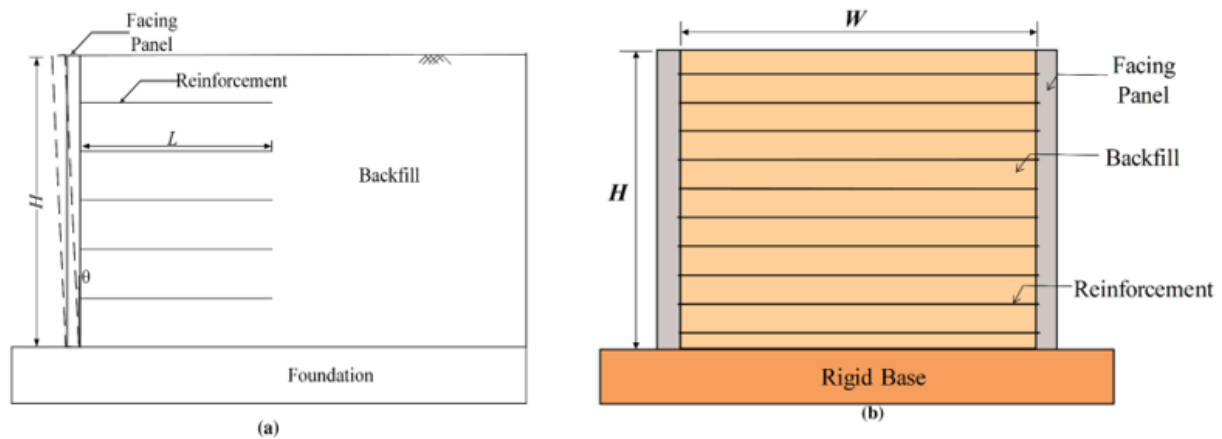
Illustration showing: (a) A full-length panel facing MSE single wall representing the lateral deformation (b) unconnected walls (Sarvanam et al., 2020b).
